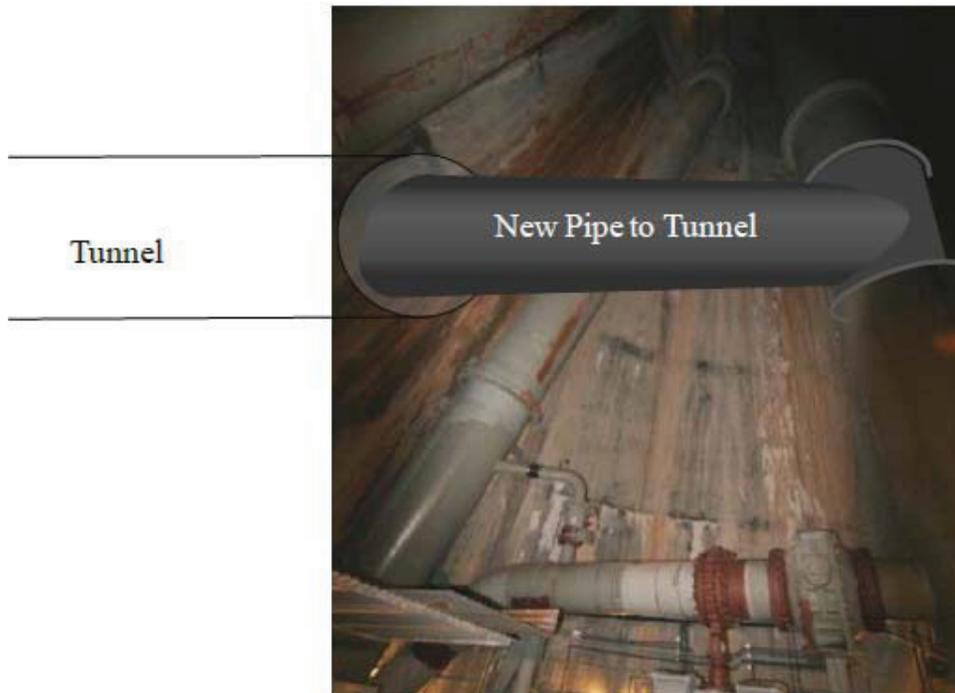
Photo and sketch of 72" pipe connection to standpipe
